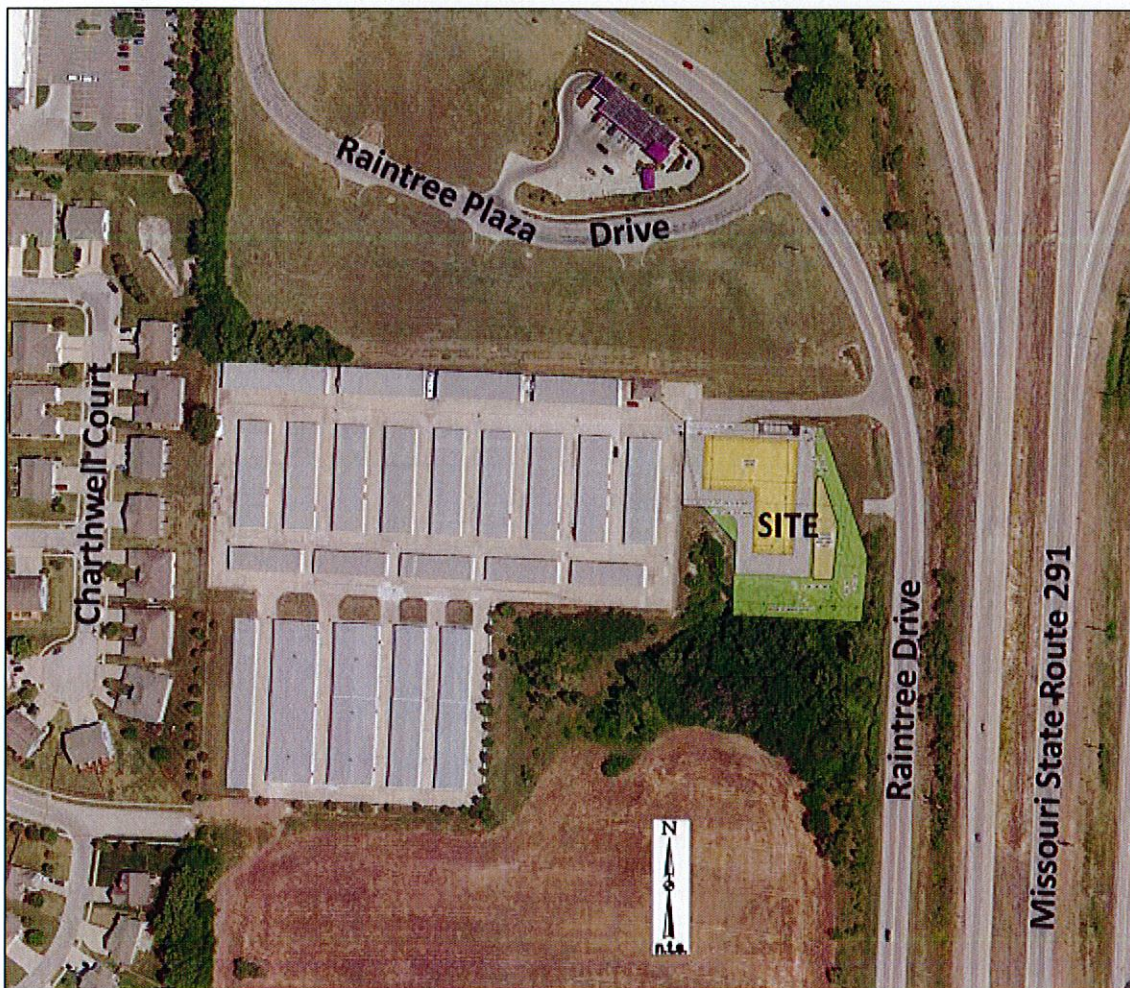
Excerpt from Proposed Site Plan (Provided by Others)
